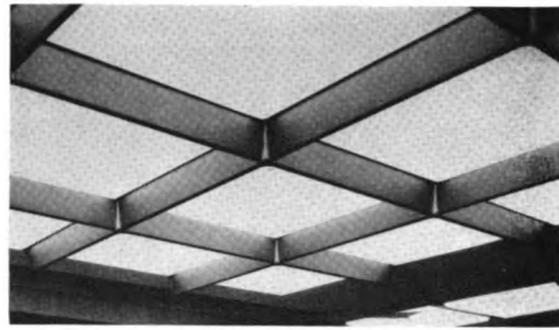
Plexiglas ceiling with acoustic baffles
